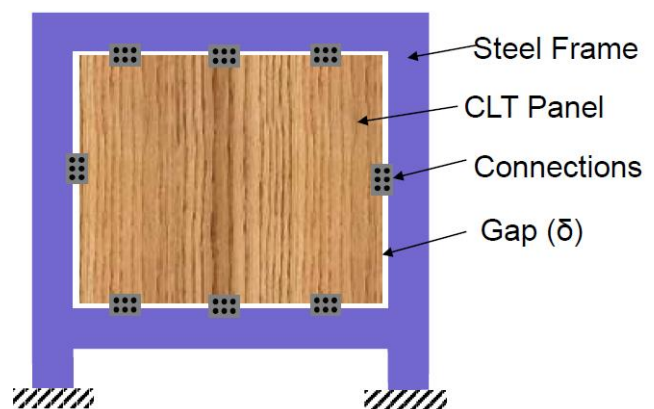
Timber-steel hybrid system with steel frame and CLT infill walls
